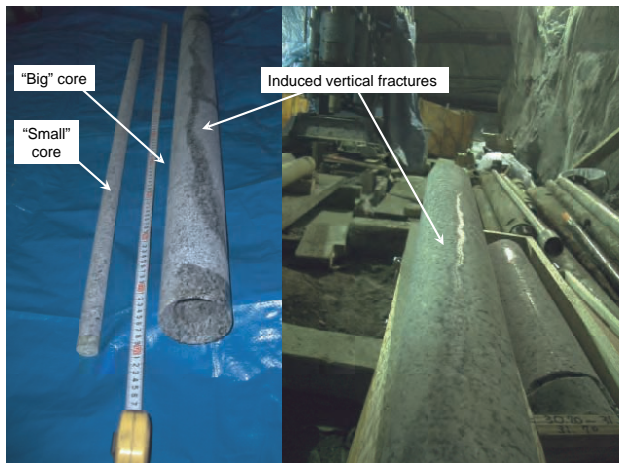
"Small" core (AQ size) retrieved by the baby hole drilling and "big" core (PQ size) retrieved by the over-coring. Hydraulically-induced fractures appeared in the big core.
